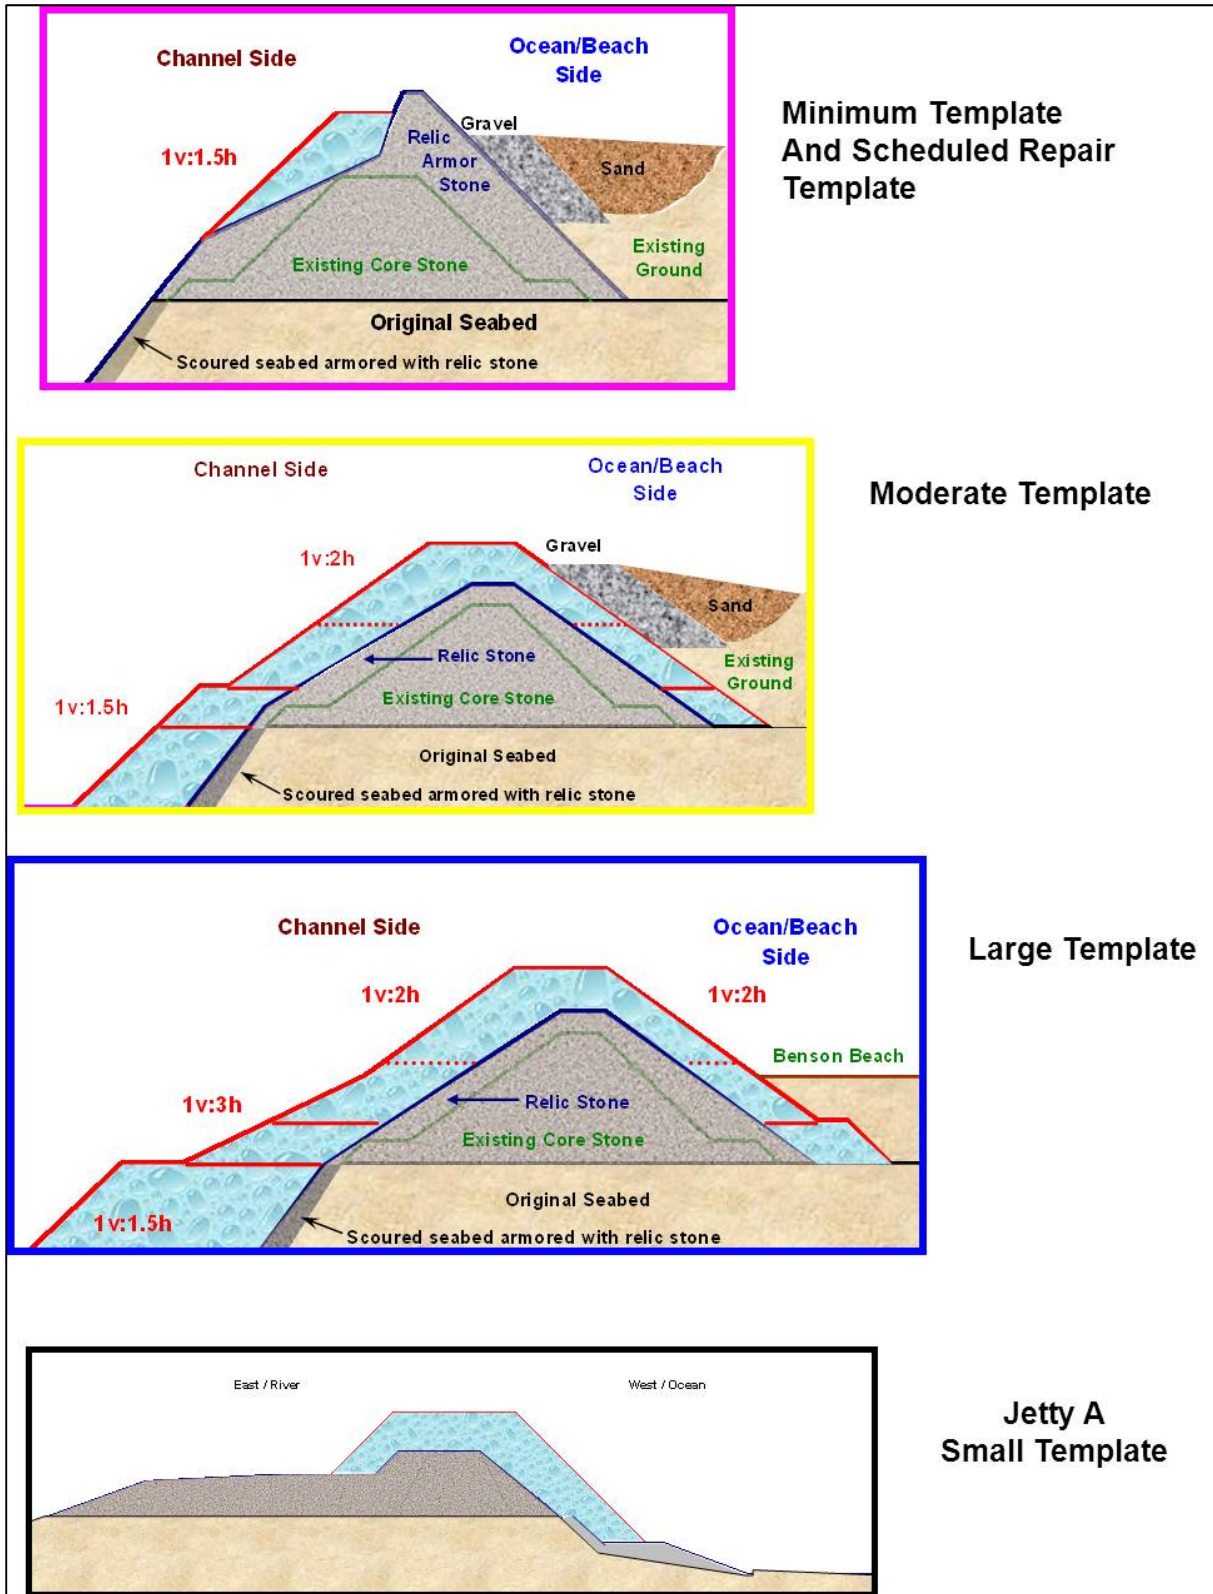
260. North Jetty and Jetty A Conceptual Cross Section Templates
